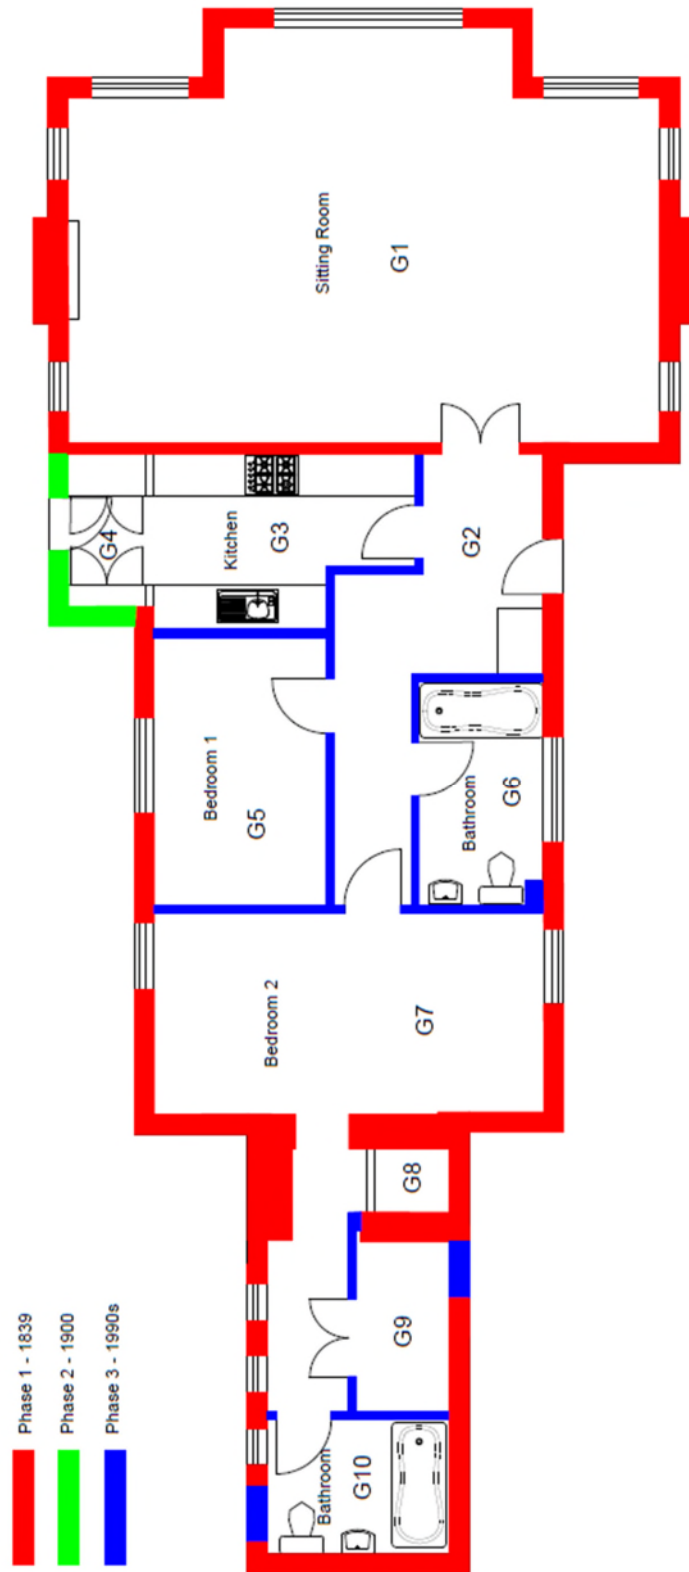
Phase plan of 19 Bears Rails Park (2018)
